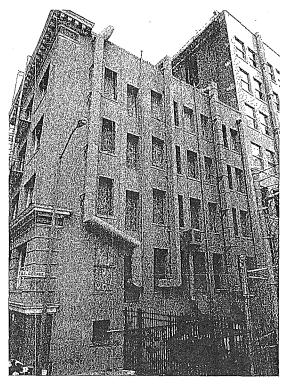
Photography of St. George Alley elevation. Note punched window openings are boarded up with plywood at interior (photograph taken on 01/26/2018).
